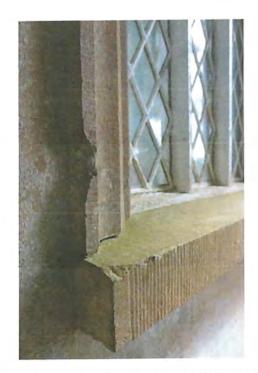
Example of minor damage to edge of window surrounds at GW.01.
